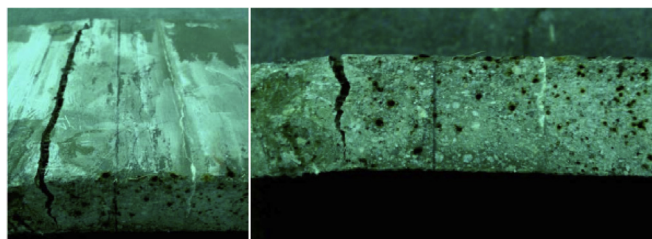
Healed crack and new crack formed in post-healing tests on a UHPFRC specimen reinforced with steel and sisal fibres [47].
